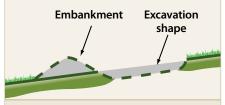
How soil is moved in constructing a graded bank. (Source: adapted from Jackson et al 1992)
